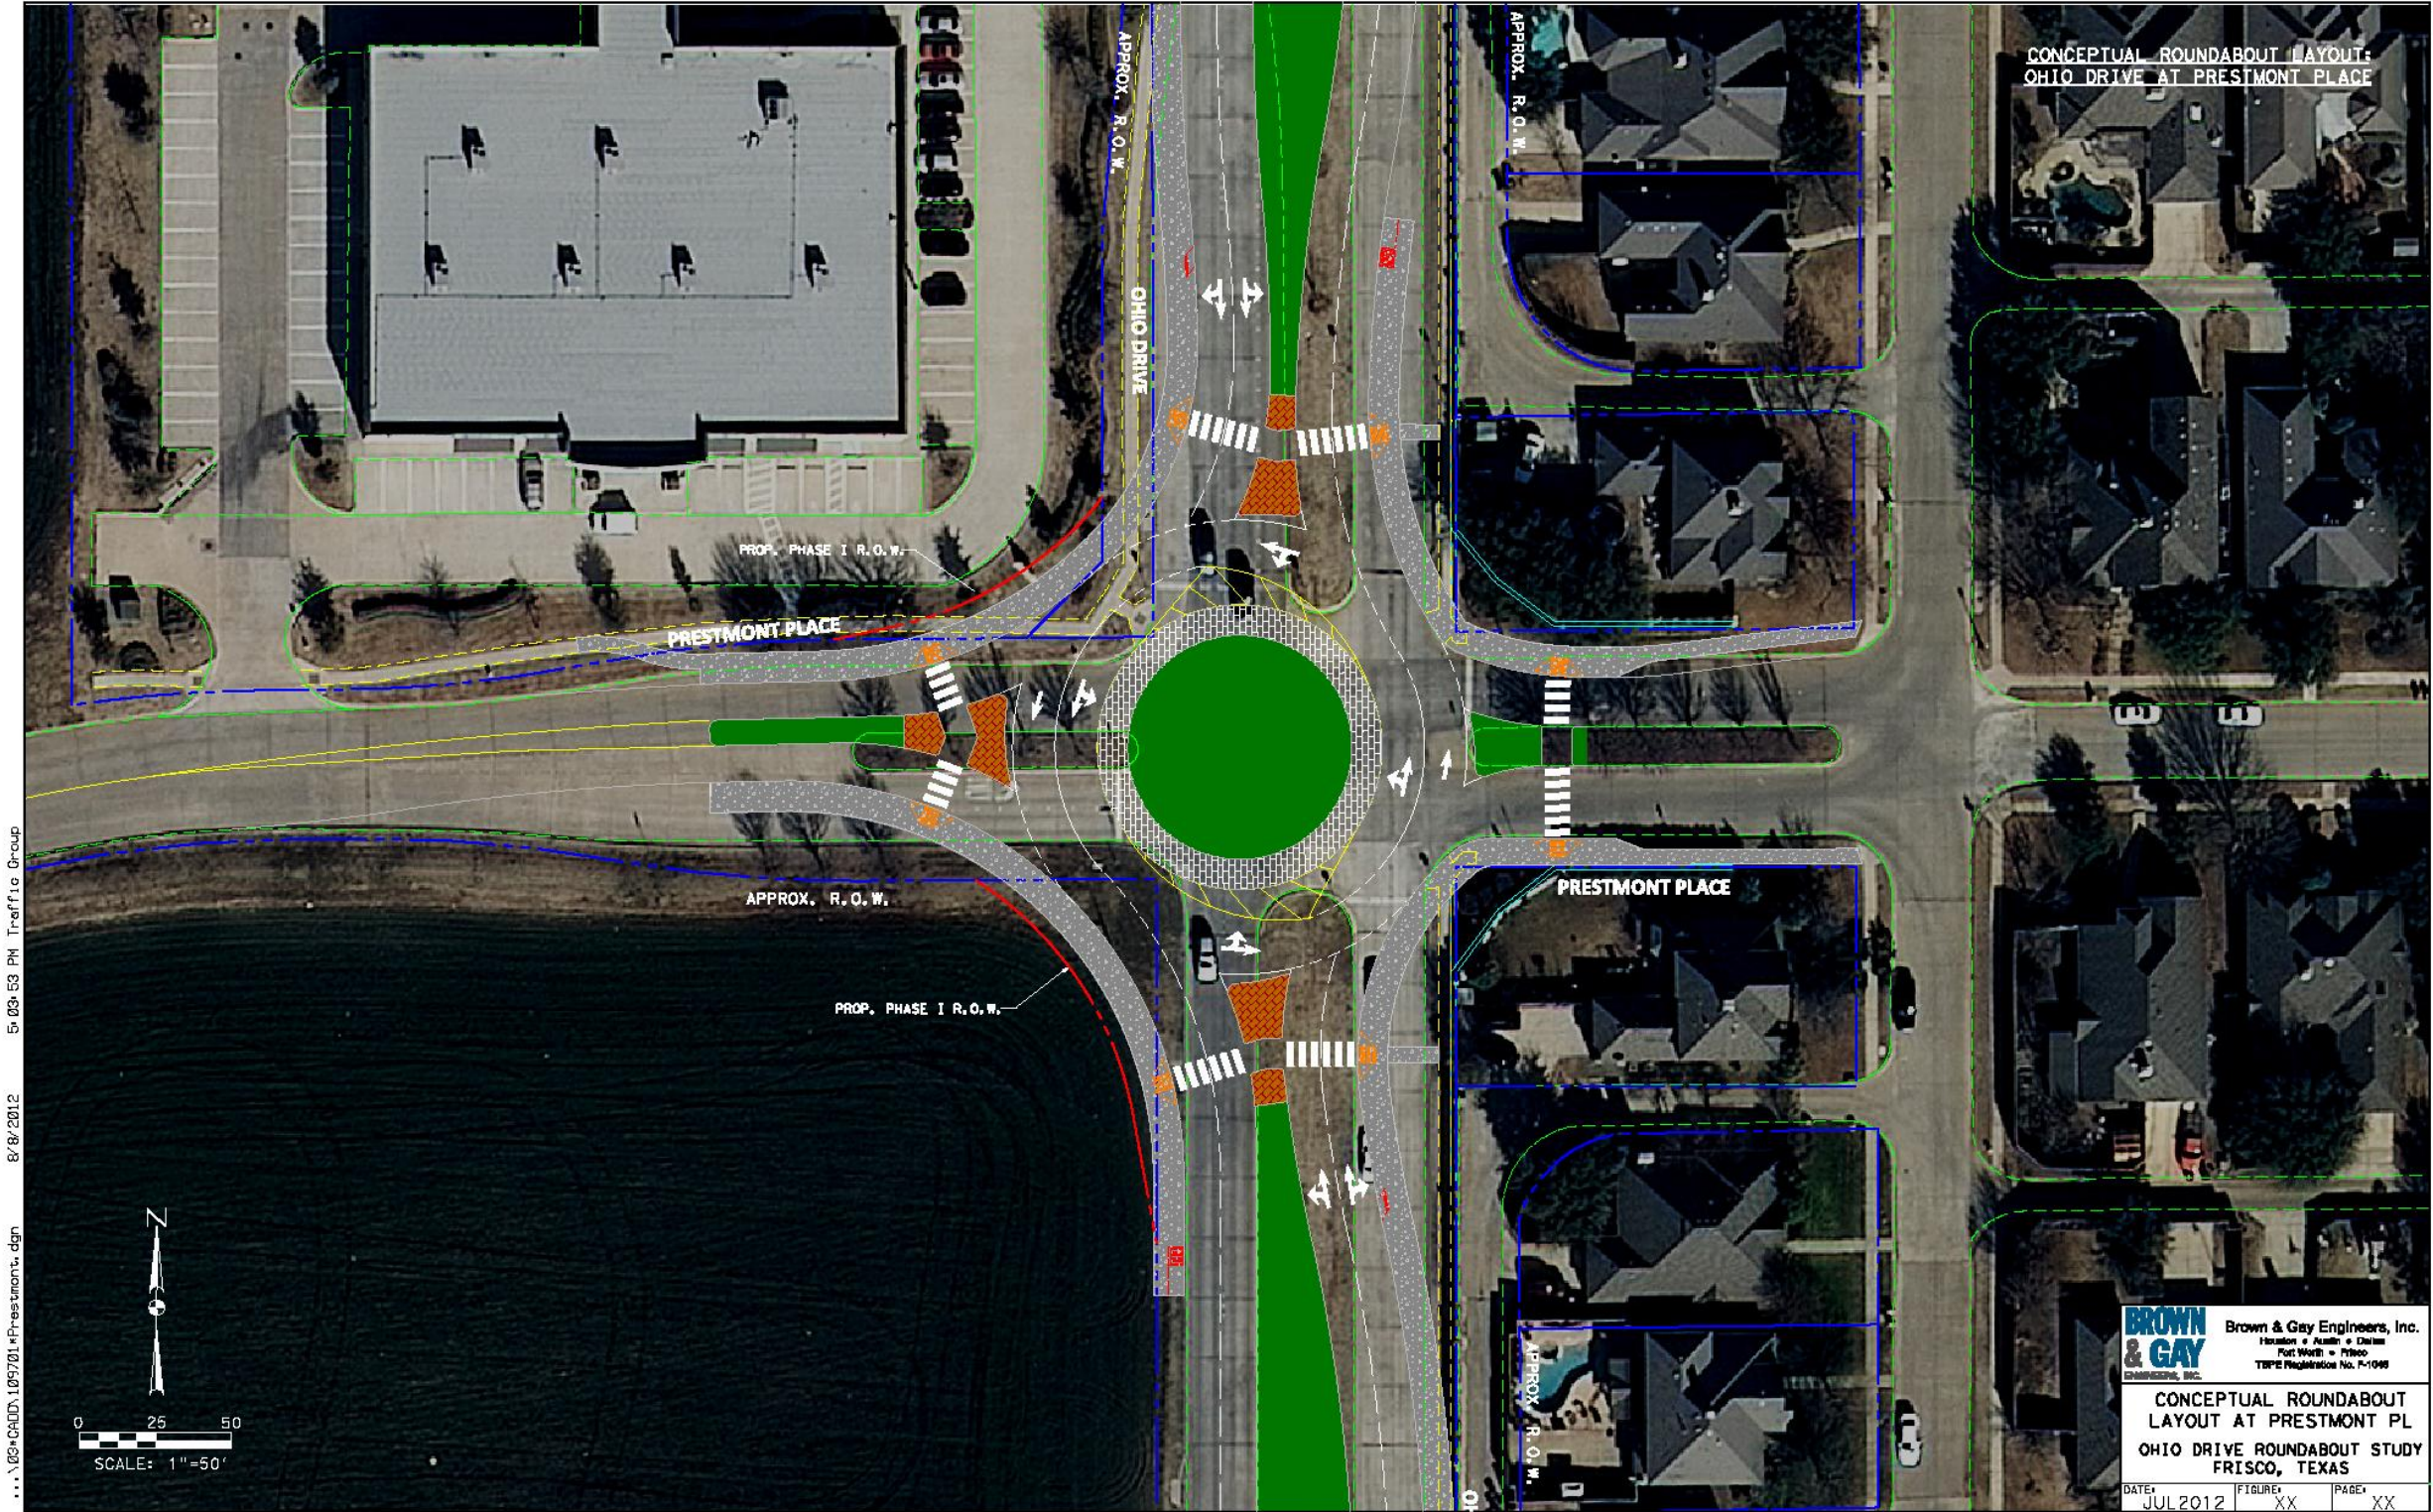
Proposed Roundabout: Ohio Drive at Prestmont Place
